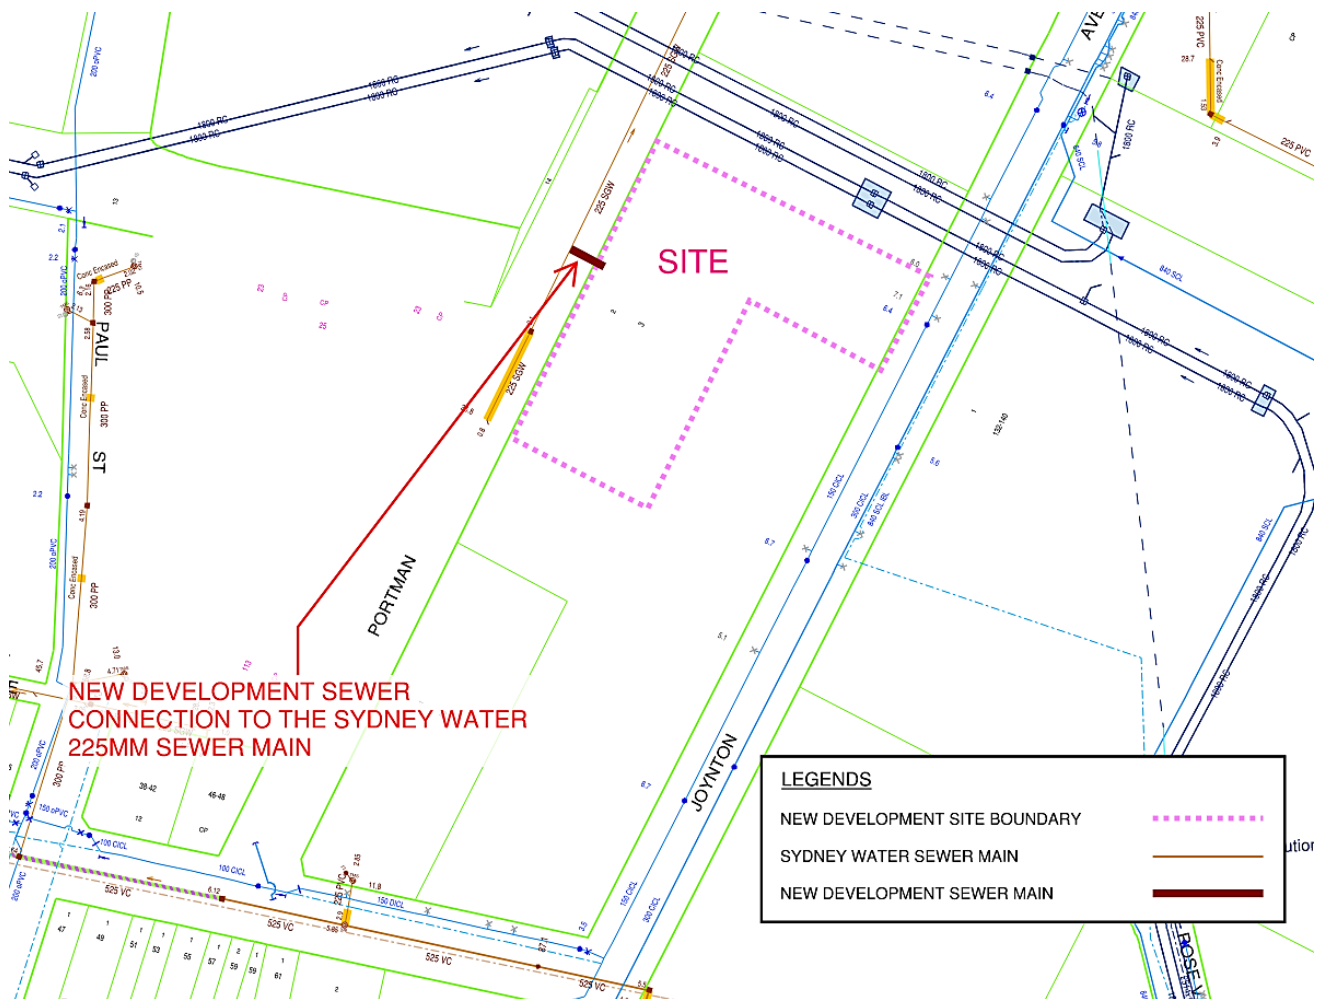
Connection to Sydney Water Sewer Main – Extract from Sydney Water Assets Plan
